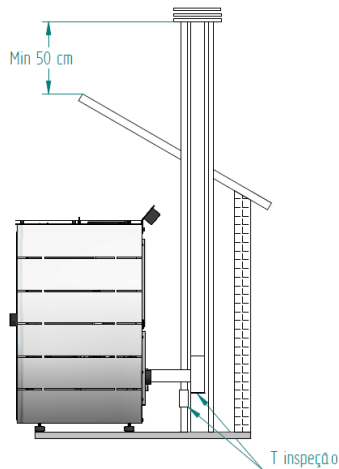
Side view of the installation with chimney, with example of the inspection point.
